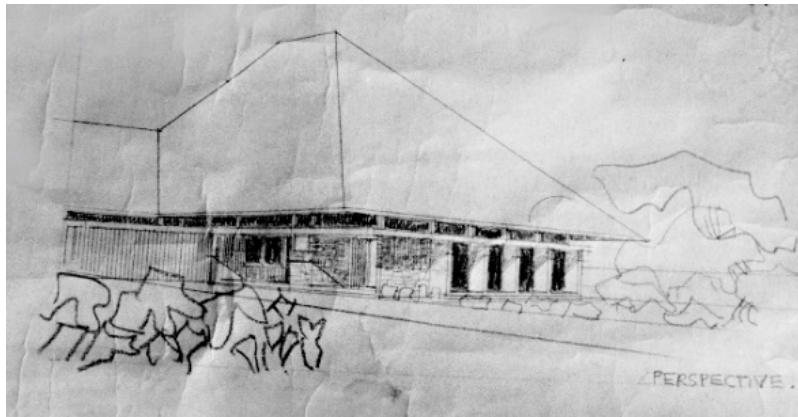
Front façade's perspective of the initial plan of Residence of Lie A Hong (around 1969)²⁾
